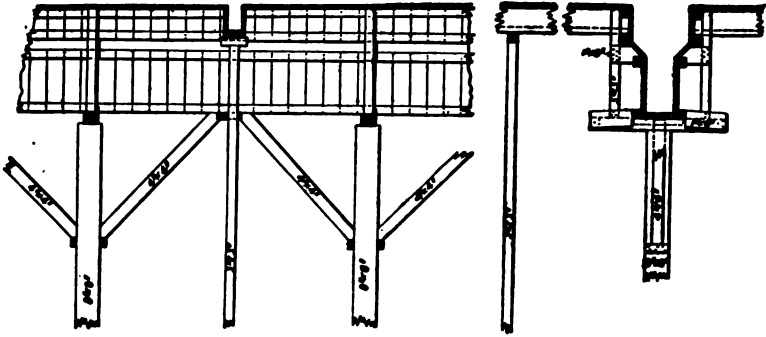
Girder Forms, Central Pennsylvania Traction Co.'s Car Barns
